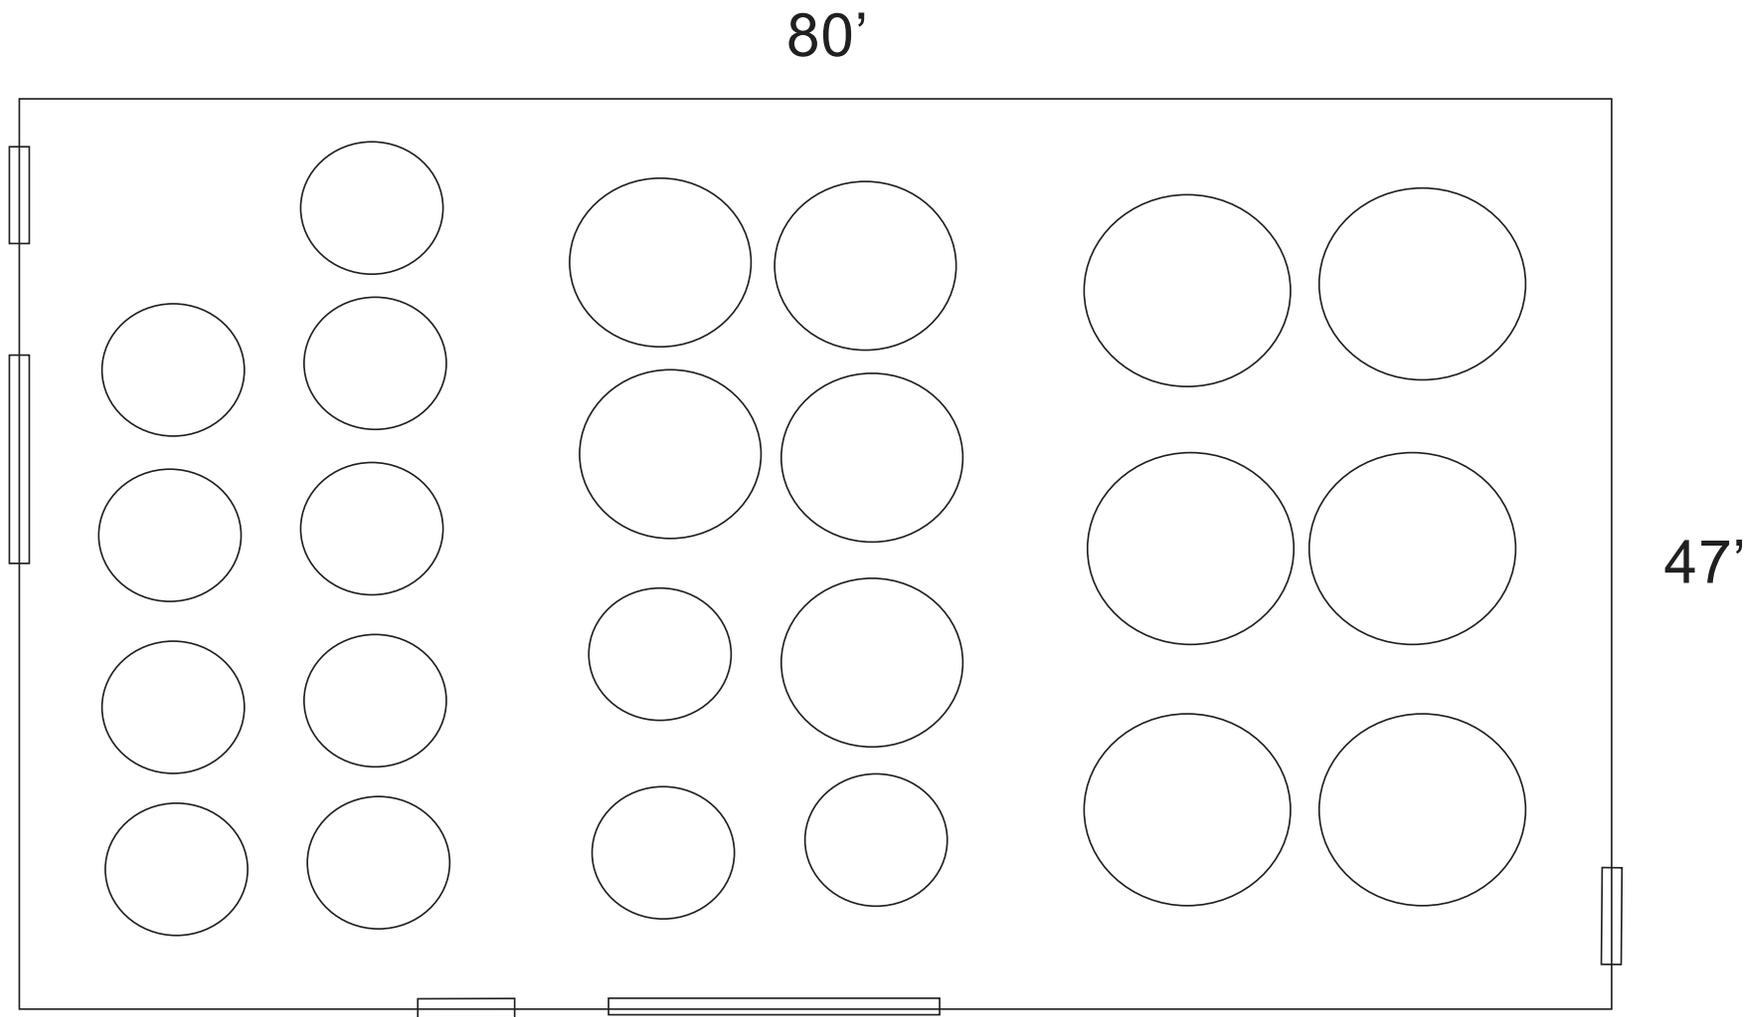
Conceptual design for wild rearing building (conversion of existing building).
